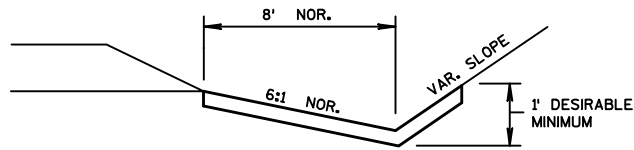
DETAIL FOR REVERSE SLOPE CONCRETE CURB & GUTTER,
